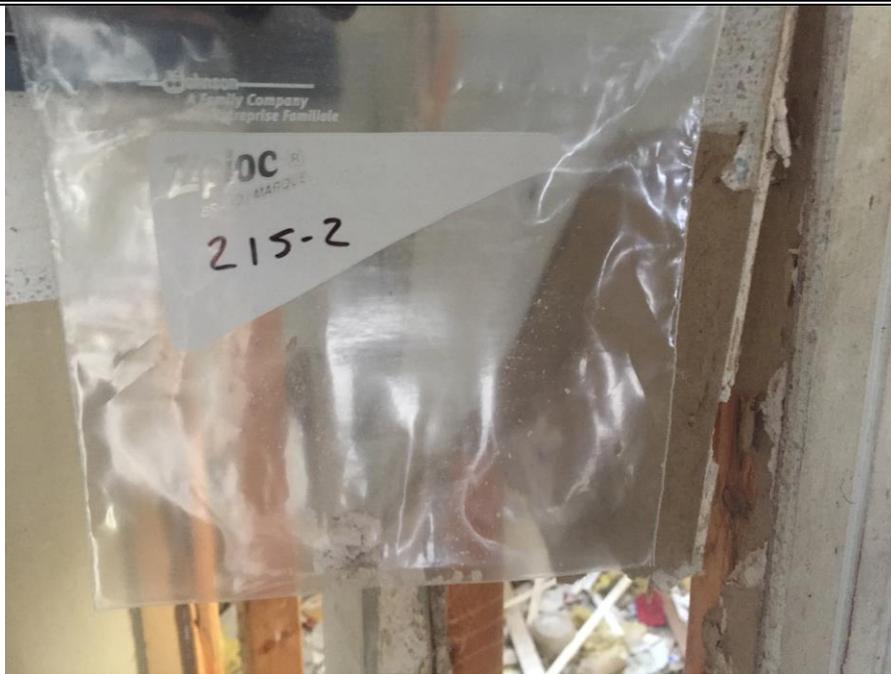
VIEW OF SAMPLED DRYWALL- KITCHEN.
